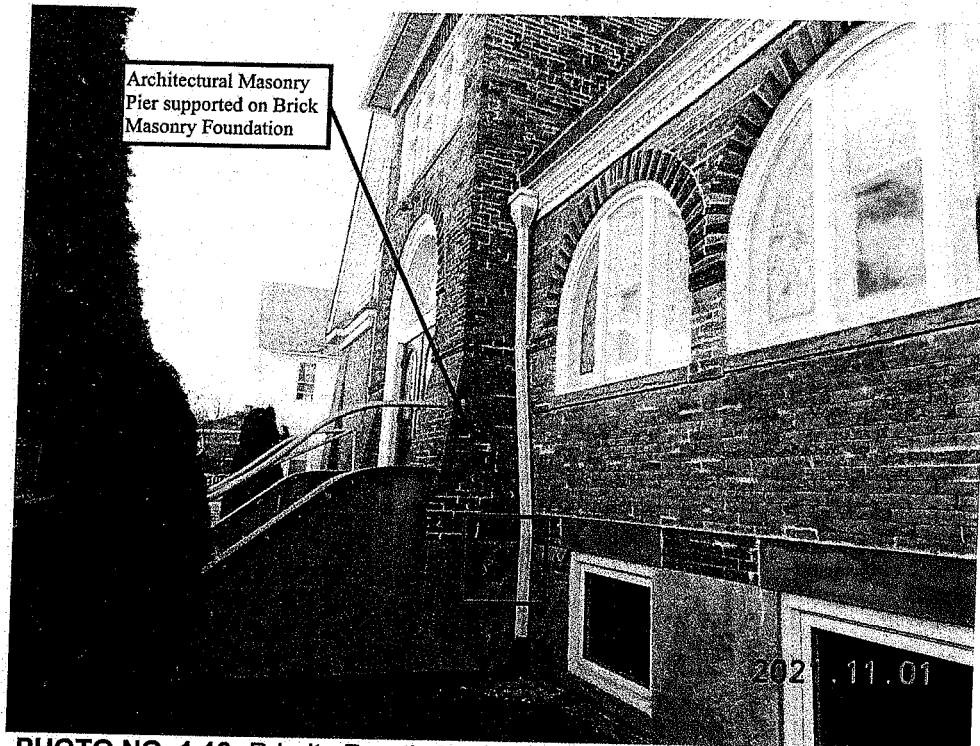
Priority Repair 2 – Overall view of unraveling brick masonry piers with spalling parge coat, deteriorated / washed out mortar joints and softening clay bricks – North Elevation, Grid 5: El. 6' +/-
